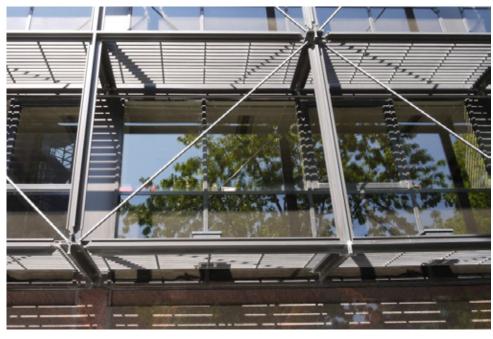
Bronze anodised curtain walling of 1 Finsbury Avenue
